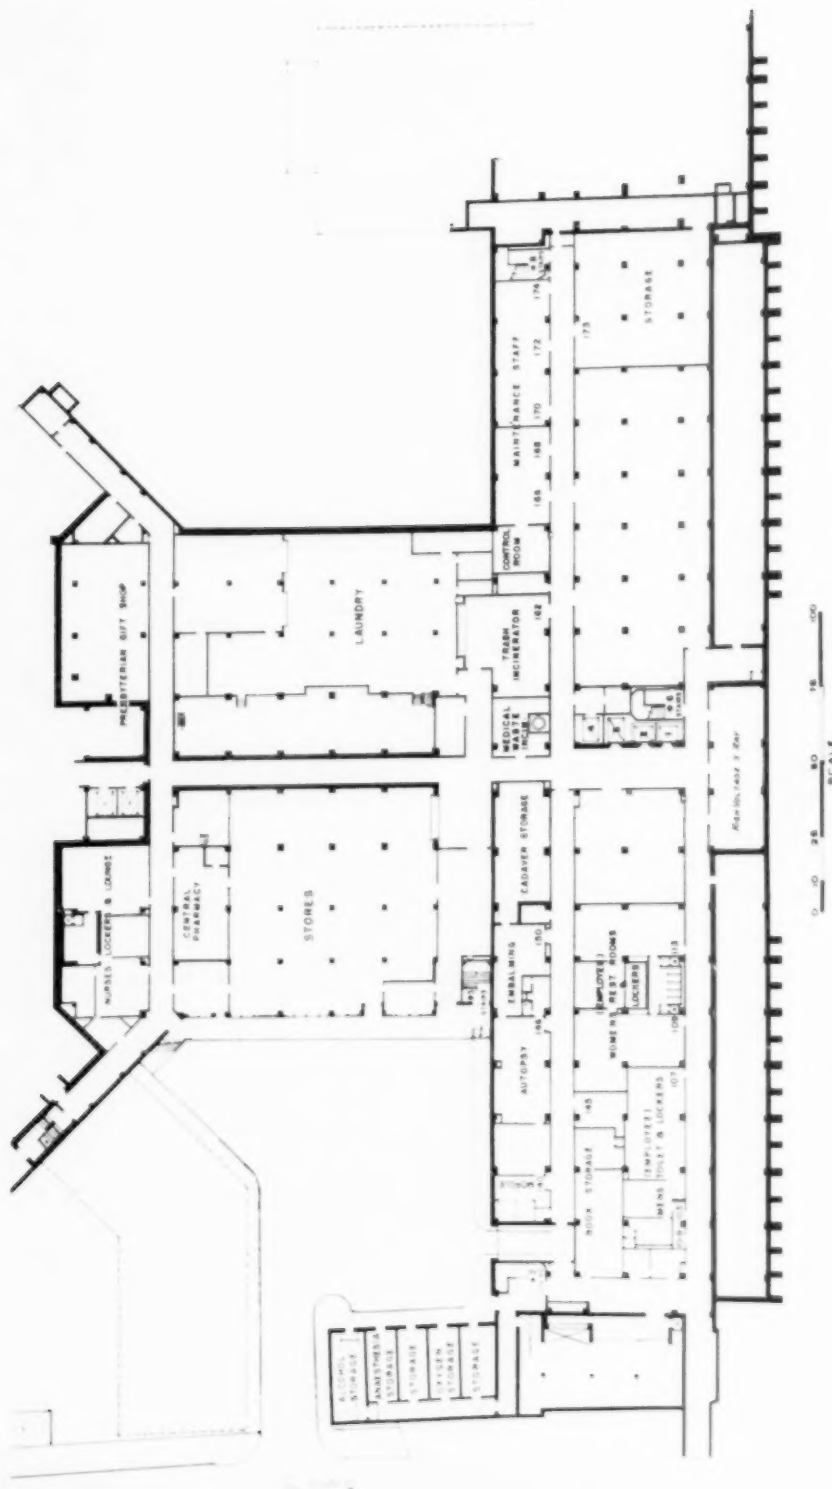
FIRST FLOOR PLAN, SCHOOLS OF THE HEALTH PROFESSIONS BUILDING,
